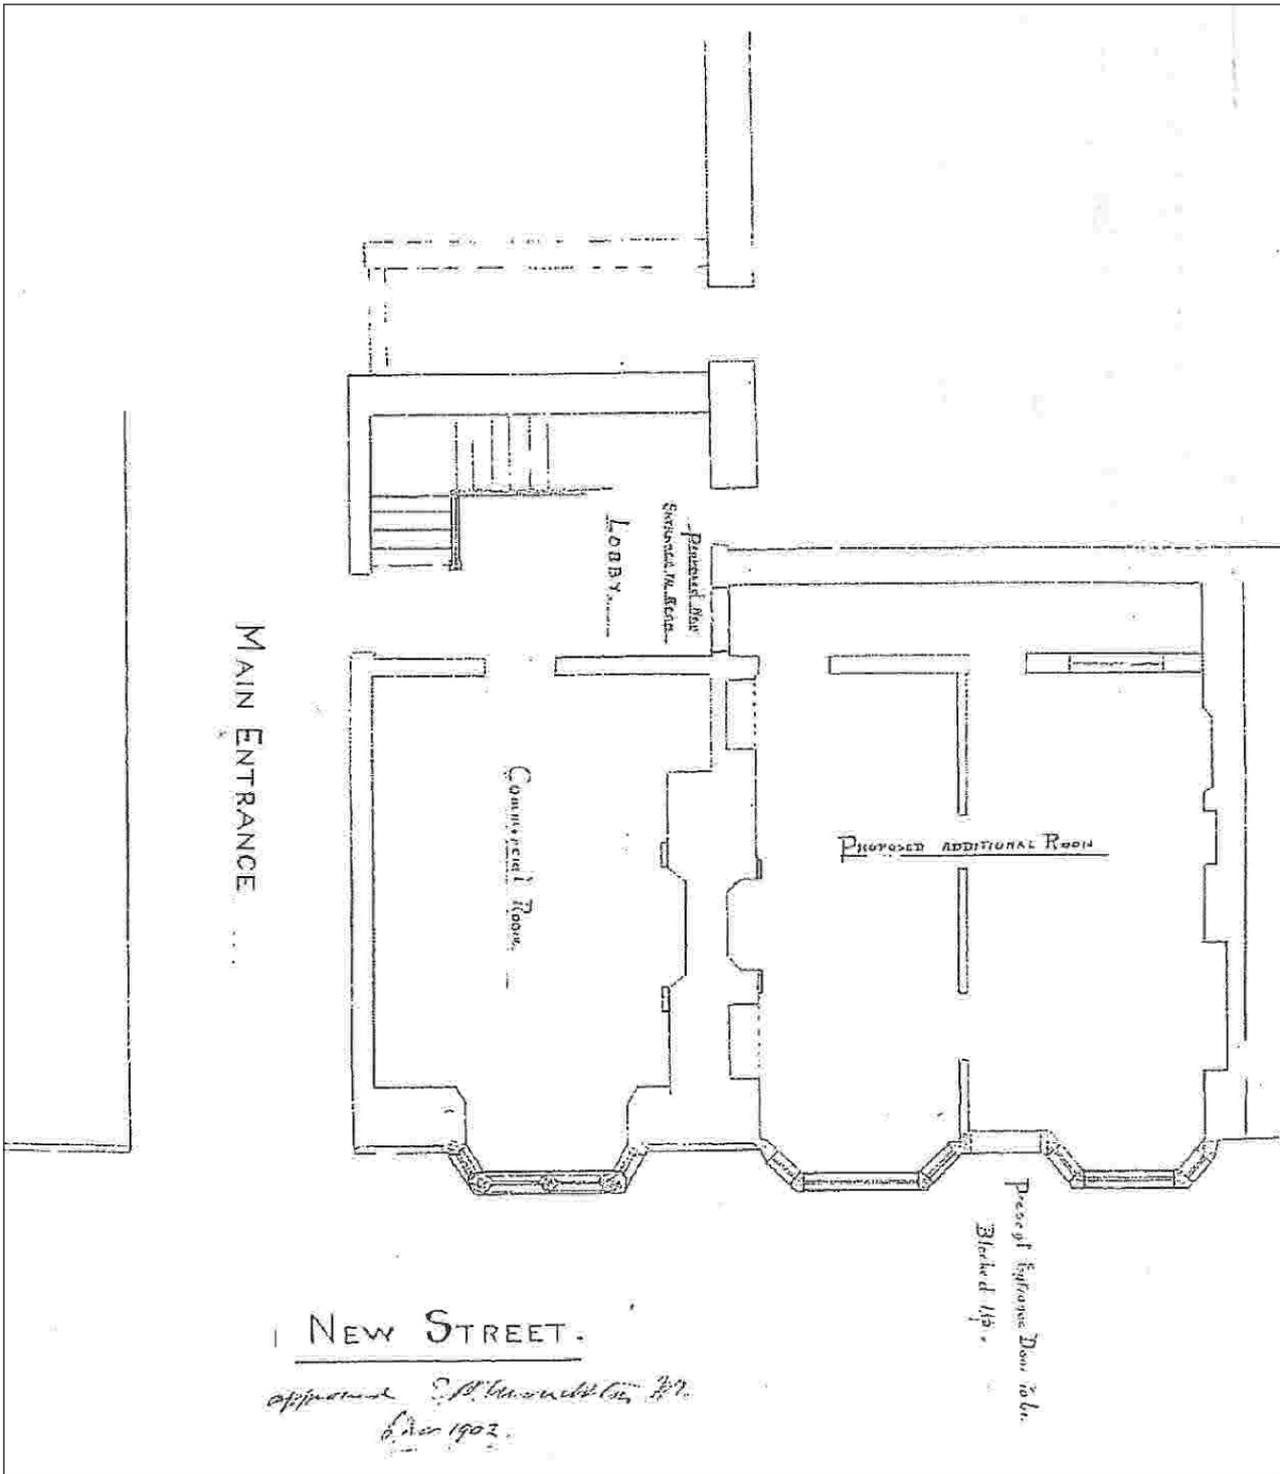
Architects plan for extension, 1902 (from J. Irving)
